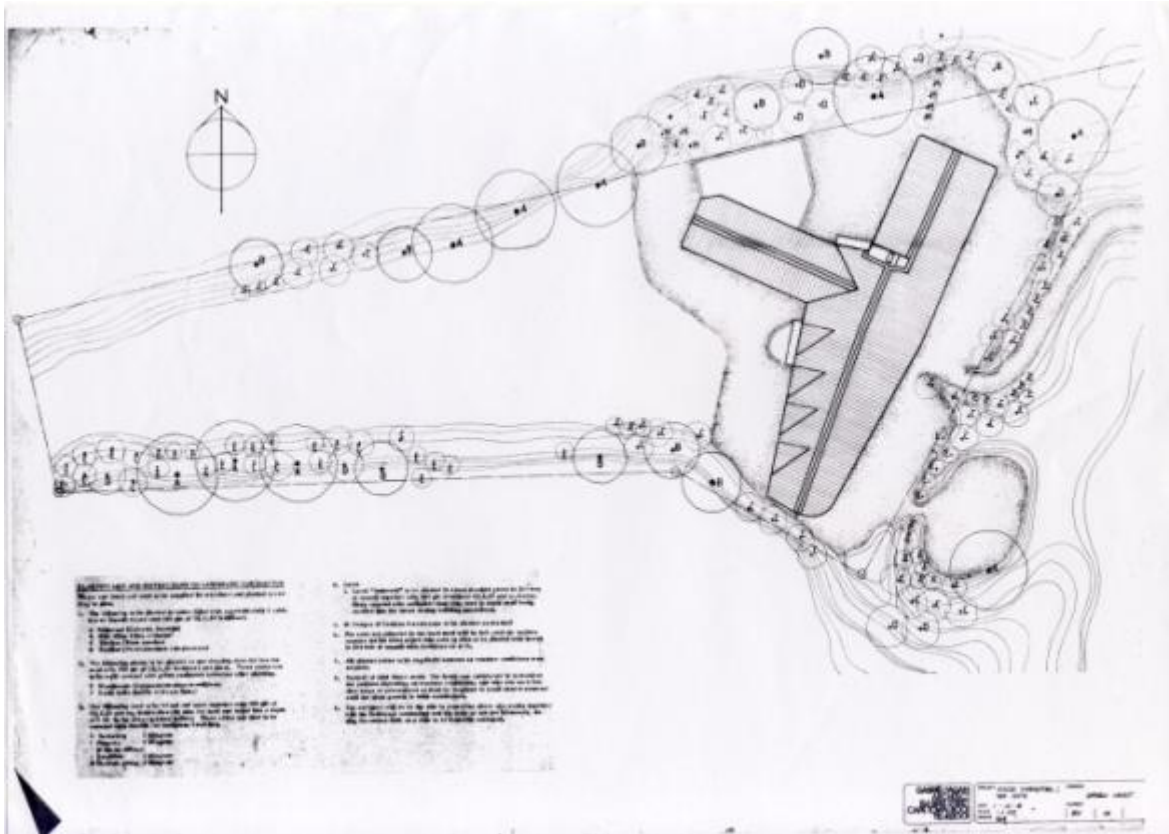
Site plan (Fagan archive - Job No. 8011, 1/12/1981).
